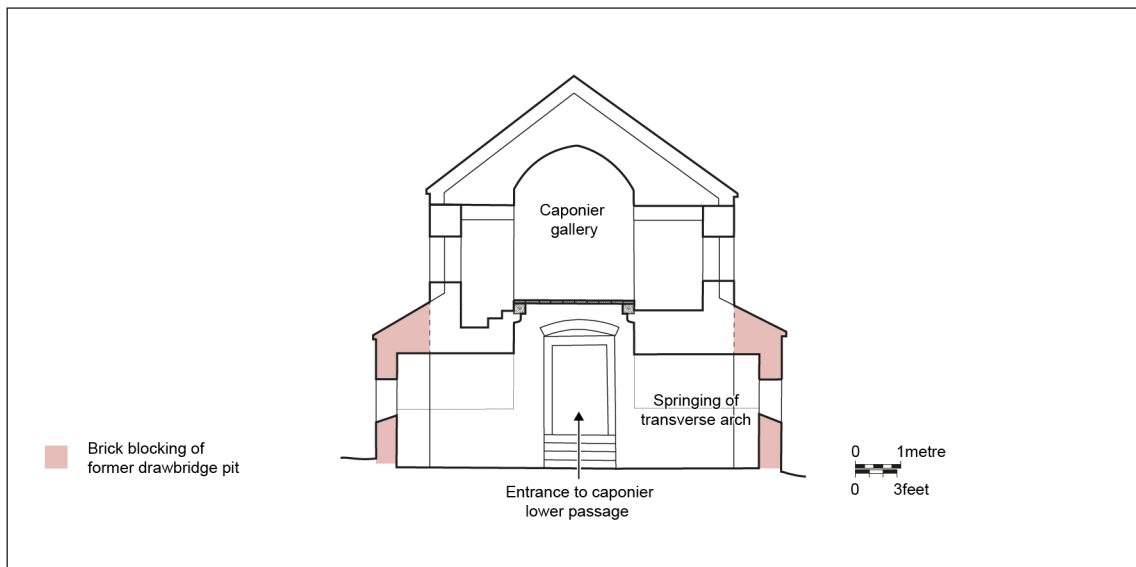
West-east cross section through southernmost bay of caponier (former drawbridge pit)
